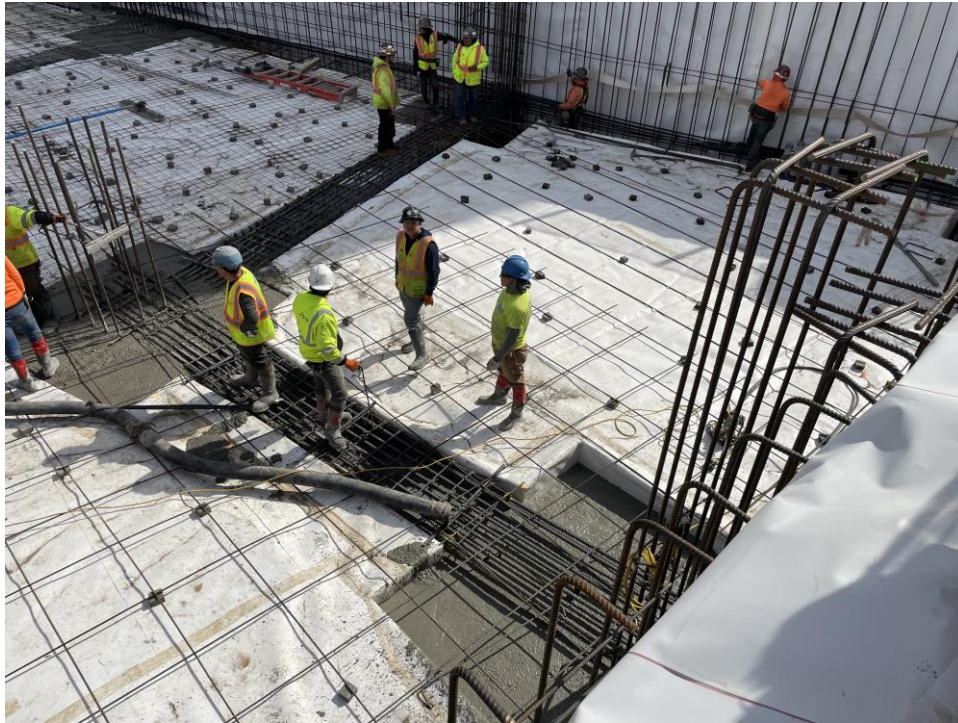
ECD pouring concrete for a pile cap in WCG COMP A (facing southeast).
